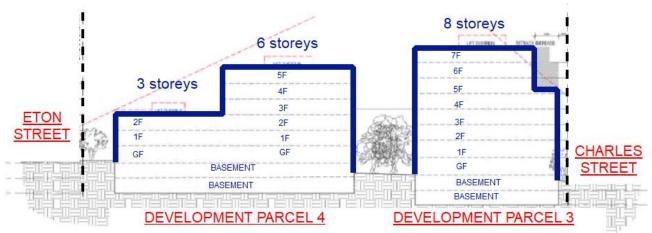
Applicant Cross Section Eton Street to Charles Street
